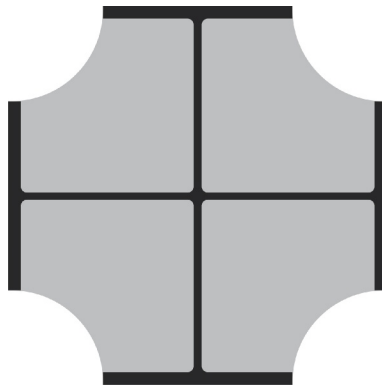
Assumed cross-section of CSCs after concrete spalling
